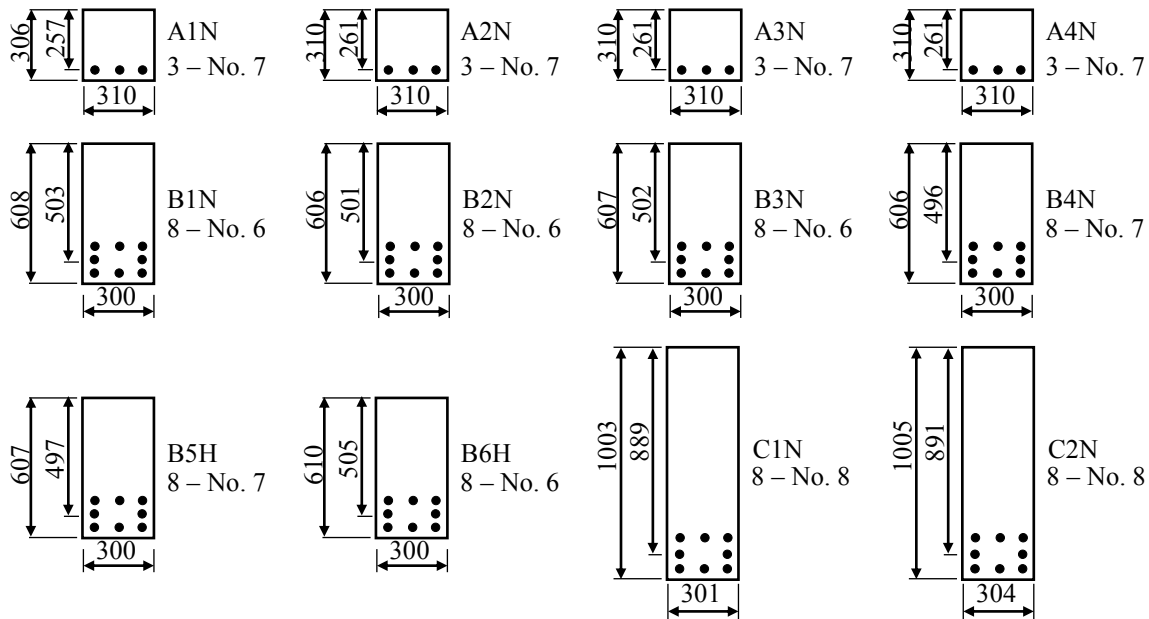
Beam geometry for specimens tested by Andermatt and Lubell 2013(a)
